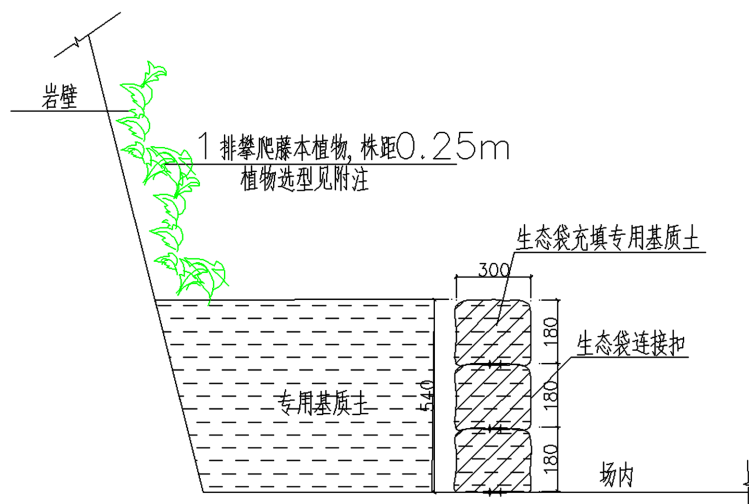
Detailed drawing of vine ecological planting trough at the foot of slope
